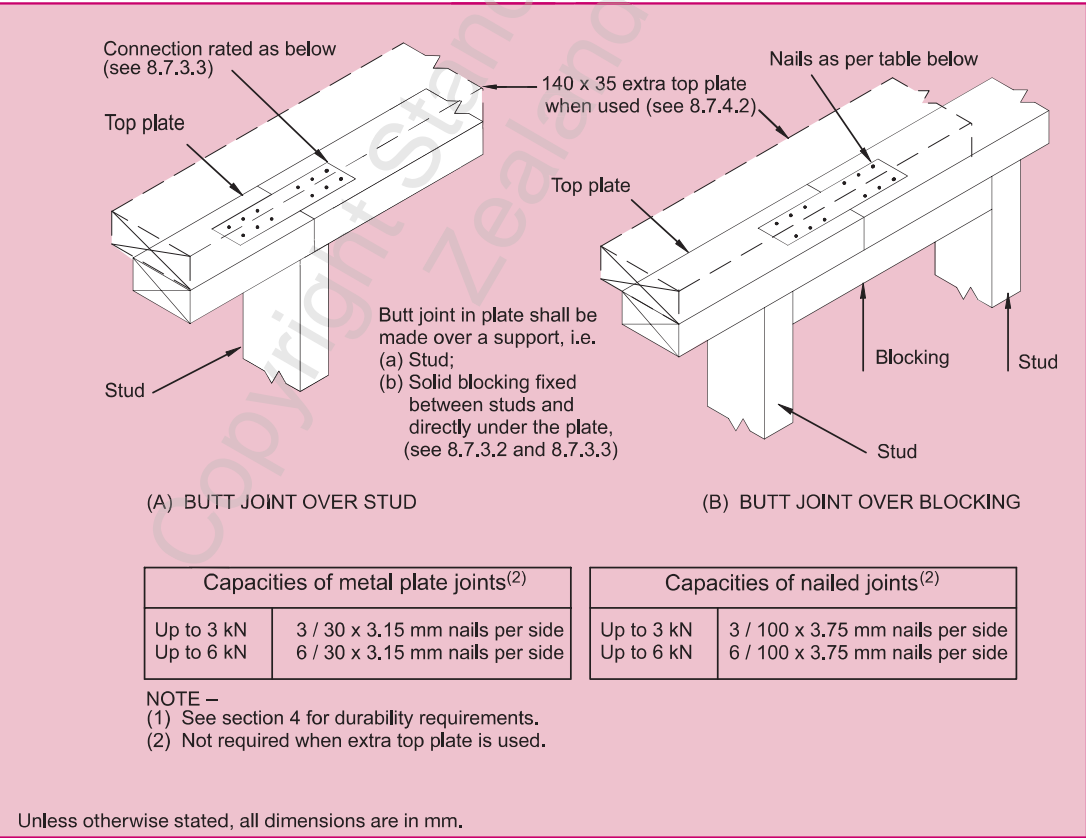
Connecting top plates in line – Walls containing bracing (see 8.7.3.3)
